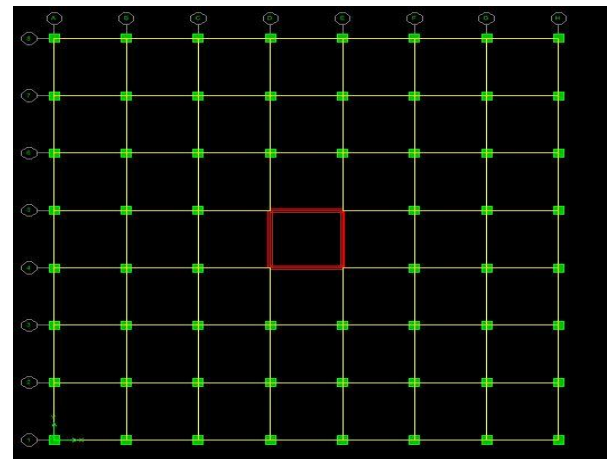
Typical plan view for model of bare frame of hard soil for zone V
